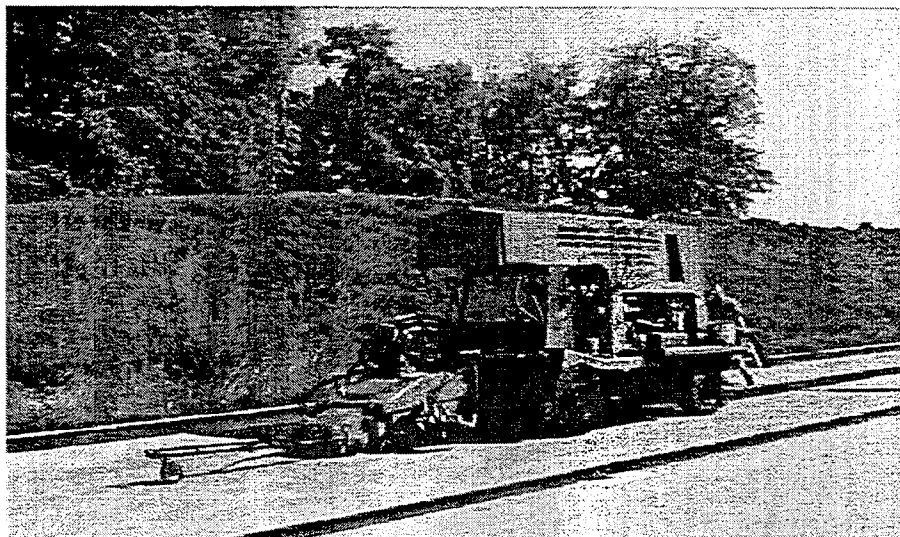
Milling machine used to install rumble strips at PTT's test track.
